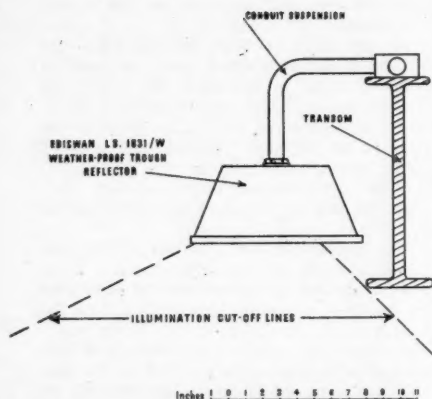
Showing mounting of fluorescent lamps on main footway of the Bailey Bridge.
